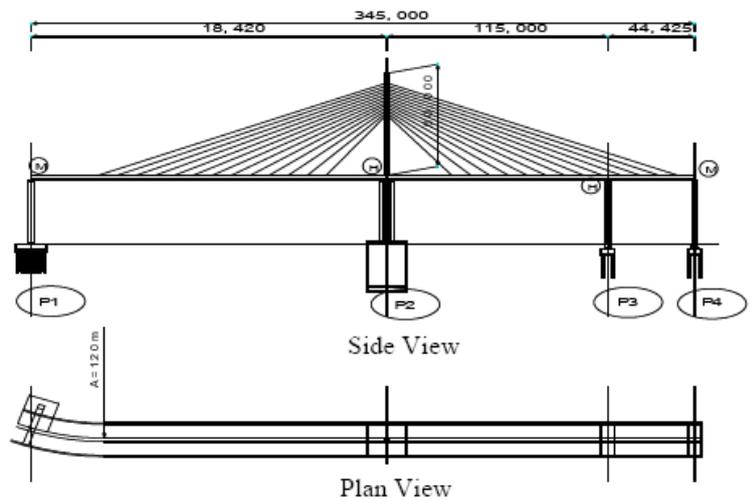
Target cable-stayed bridge (named Aratsu bridge) (unit:mm).
